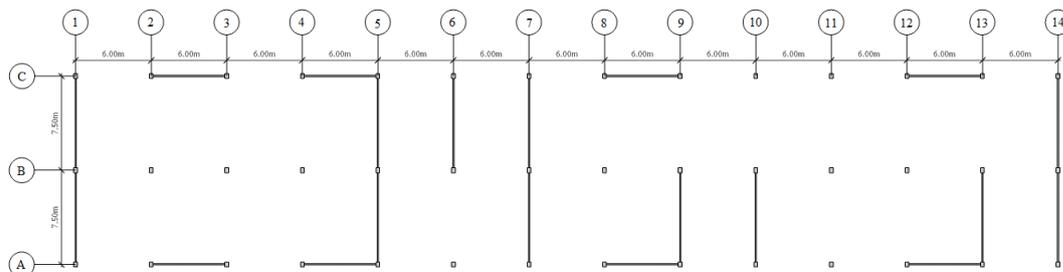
Structural plan of the hospitalized patients building. Block 2.
